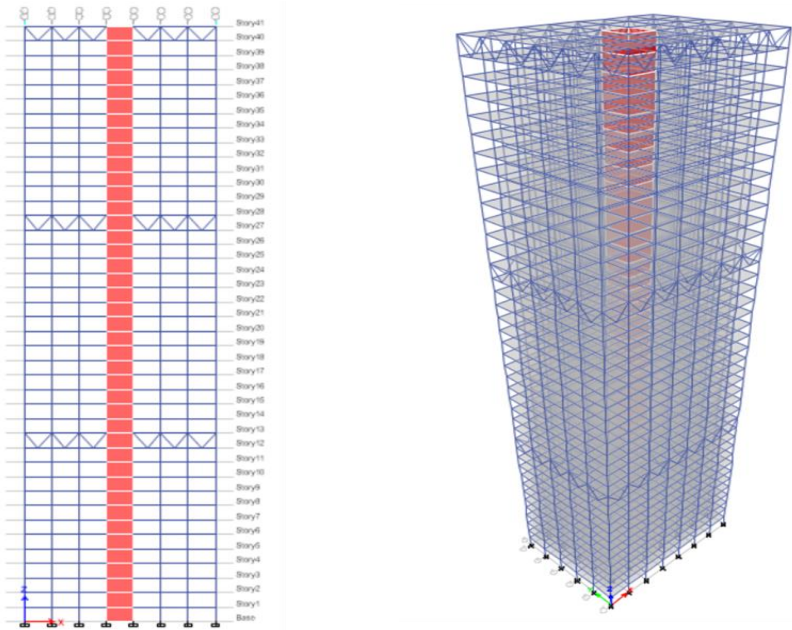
Model of G+40 Building with outrigger using V type bracing positioned at 12th, 27th, 41th Story
